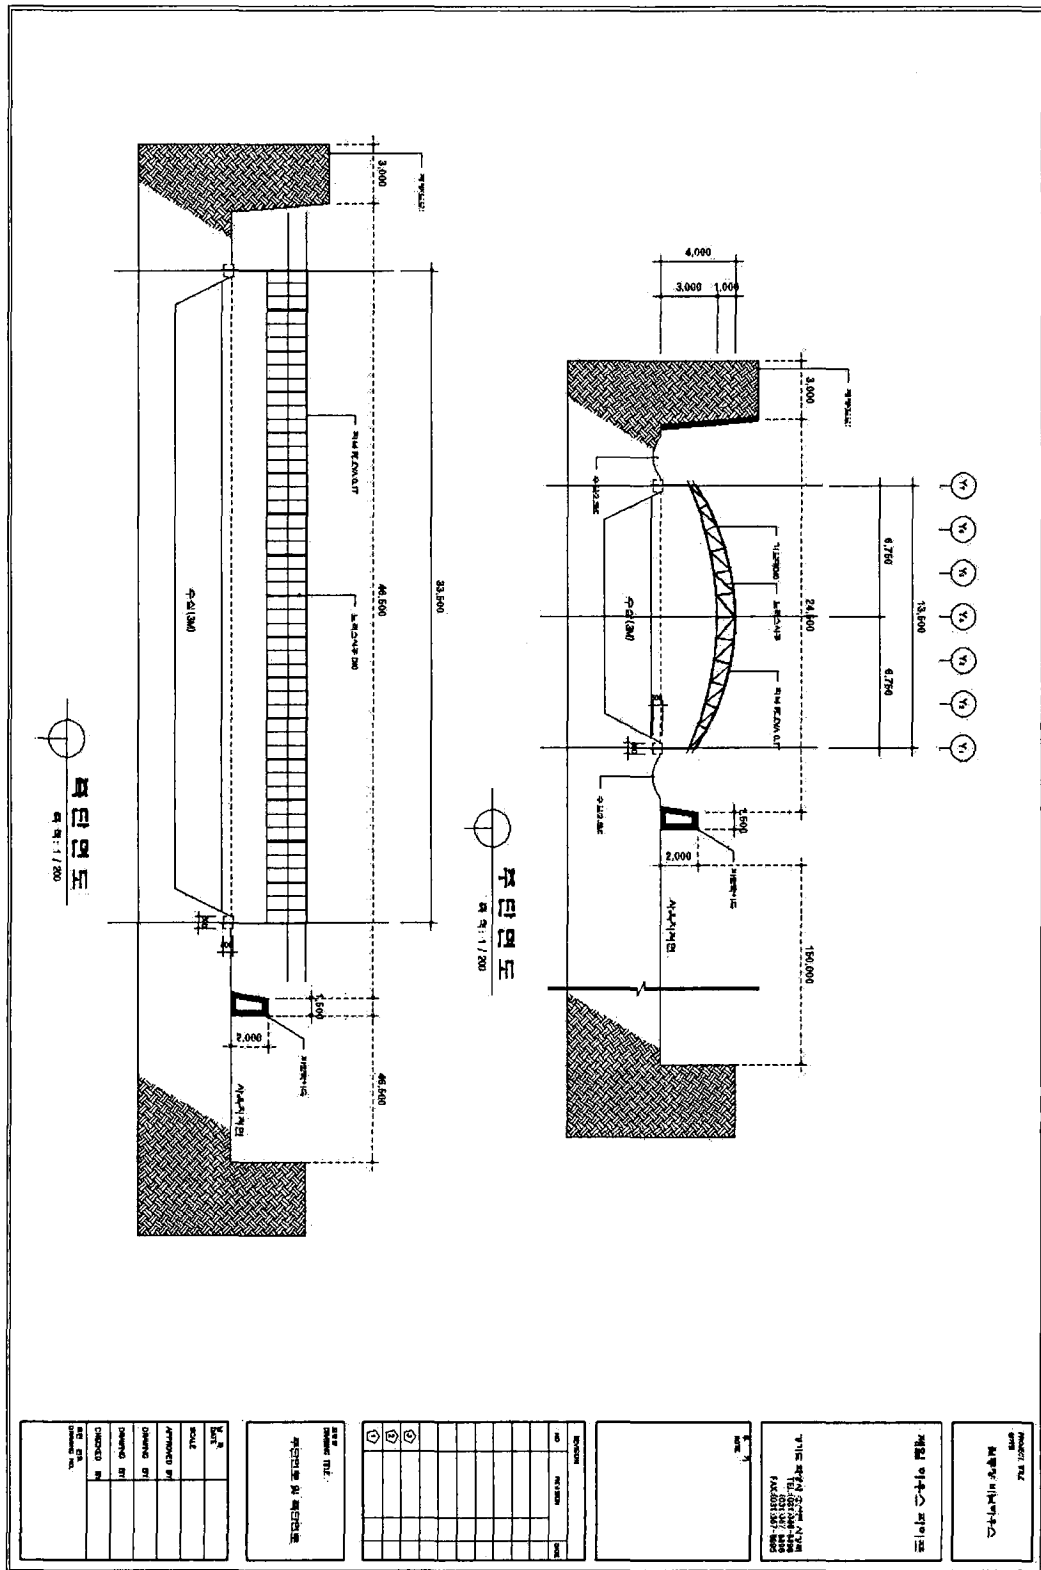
Design of wintering system in pond (plan figure of main and plan figure of side).
